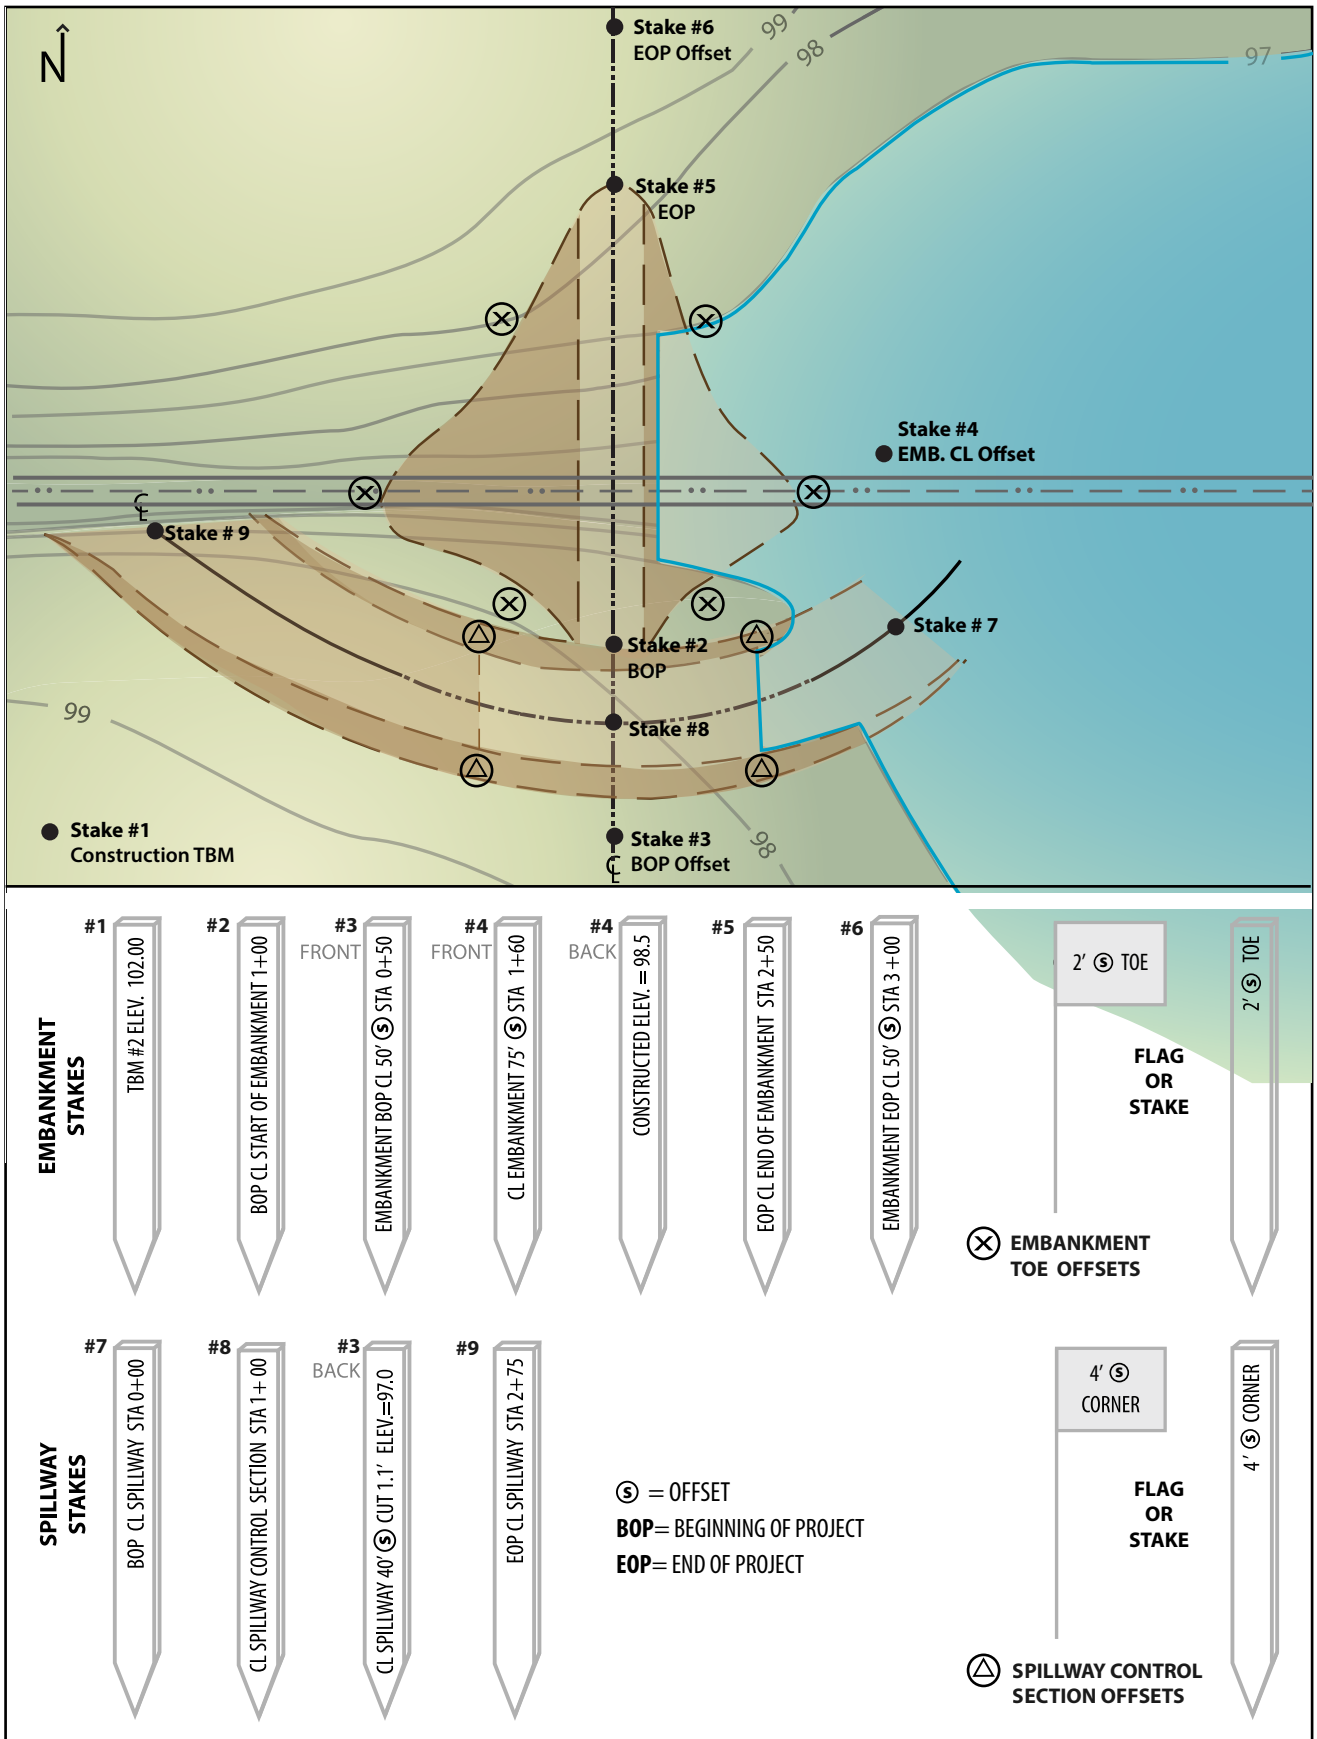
Sample Staking Plan for an Embankment and Vegetated Spillway
